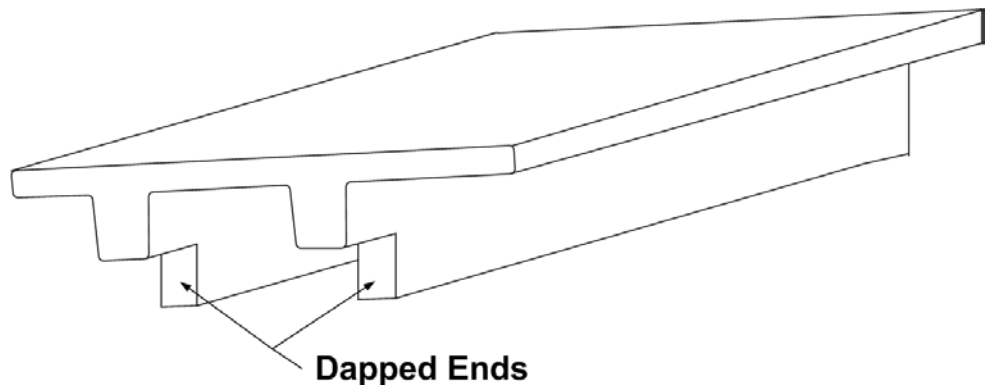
Dapped End of a Prestressed Double Tee Beam
